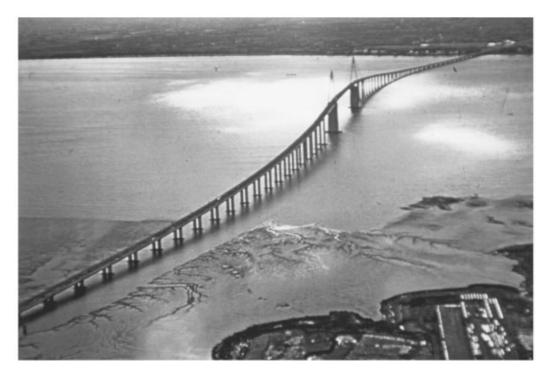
Saint Nazaire Bridge. (Courtesy of Jean Muller International.)
